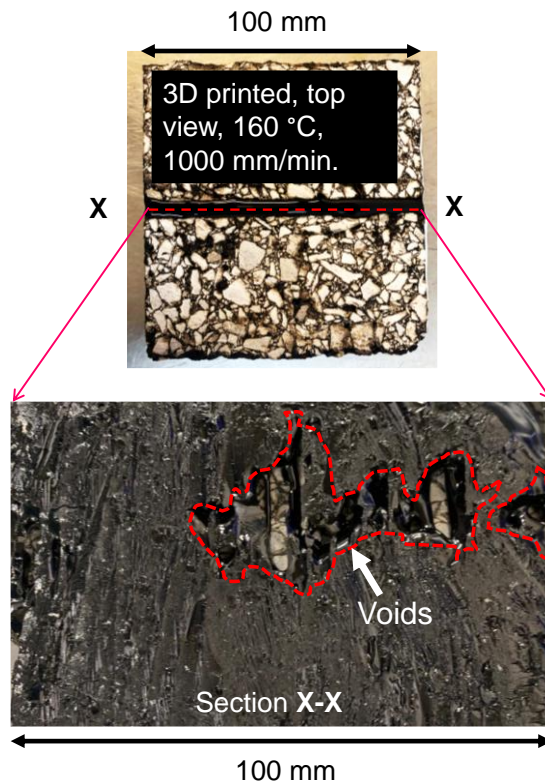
Sections through a 3D printed fill at 1000 mm/min and 160 °C for 40/60 pen bitumen in a regular crack after shear-splitting at 5 °C.
